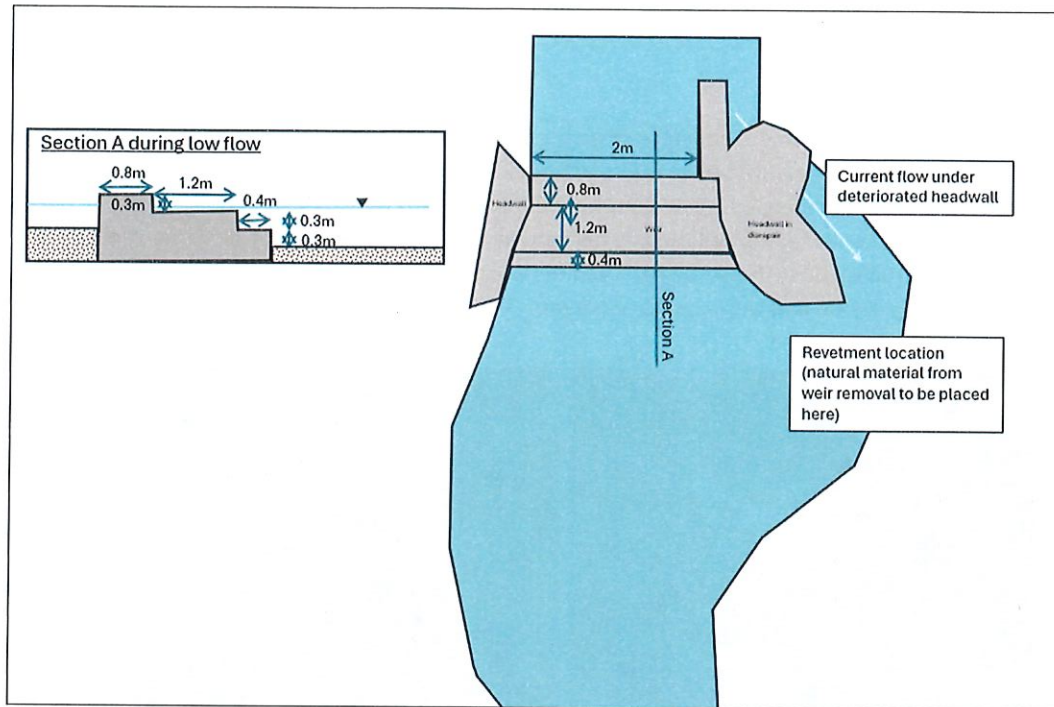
schematic showing plan view and long section through the existing weir to provide an idea of scale
